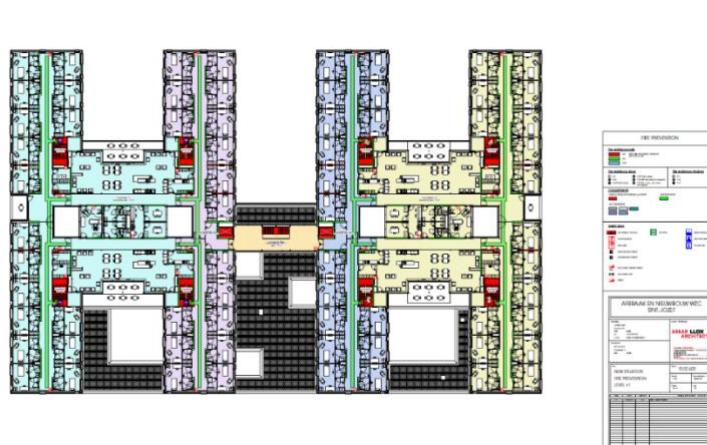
Example output: Fire safety plan of a construction project in Belgium (ASSAR)
